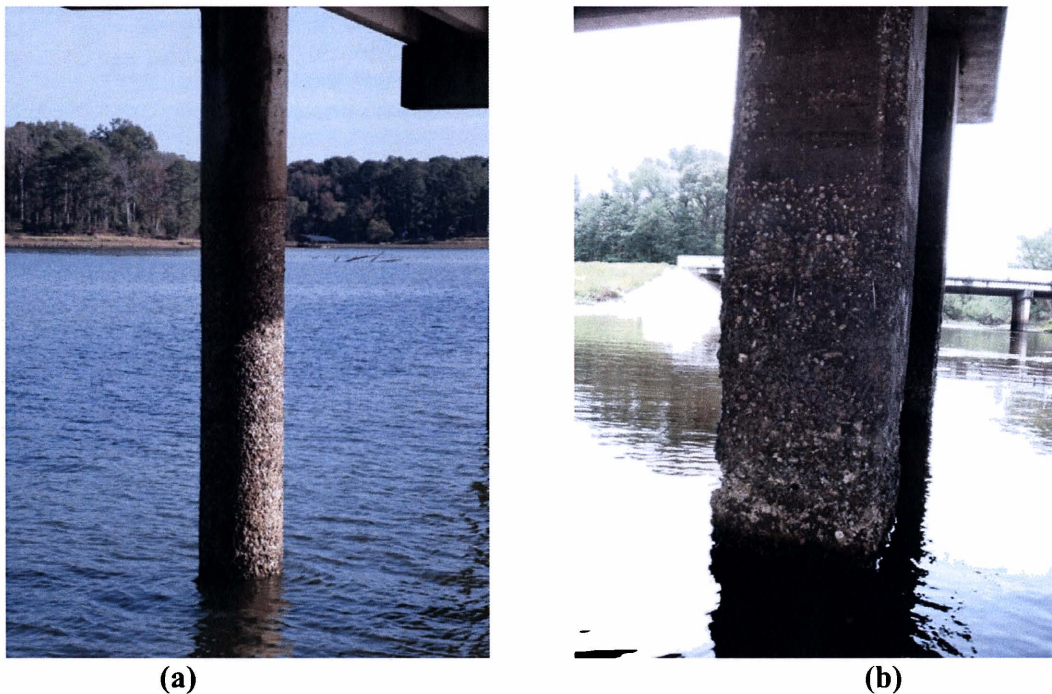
Examples of Deteriorated Concrete Bridge Columns with Suspected MID.
